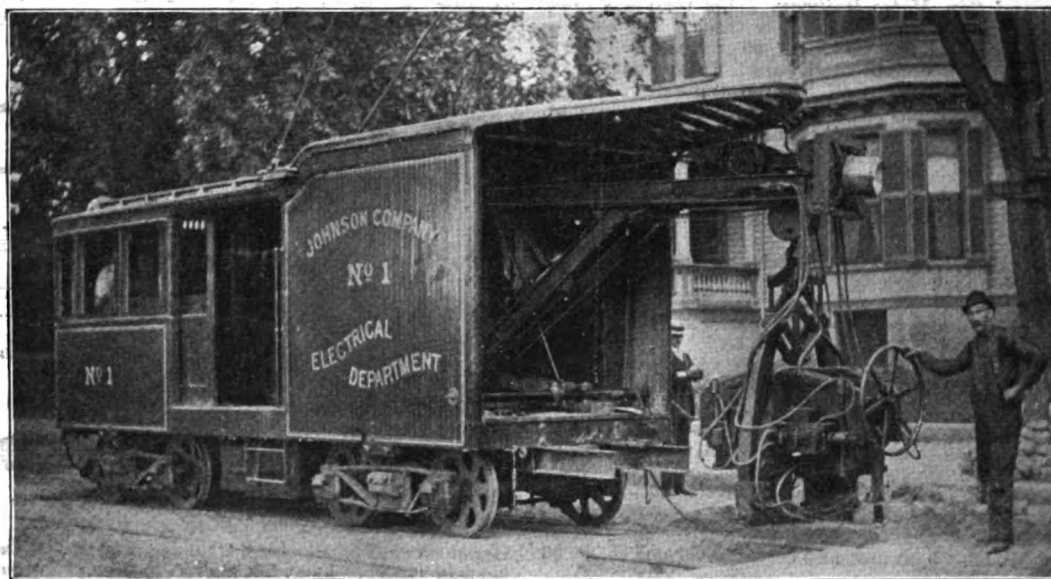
ELECTRIC RAIL WELDING CAR ON WEST END RAILWAY, BOSTON.
